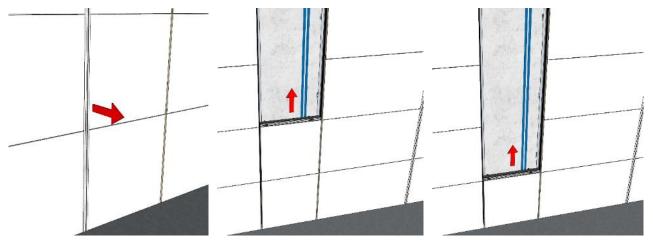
3D images illustrating the sequence of panel dismantling for installation inspection [drawing created using SketchUp]
